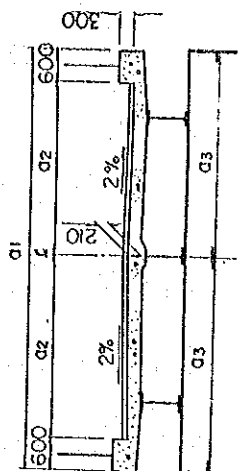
(1) Facility Alternatives for Bridge and Culvert
